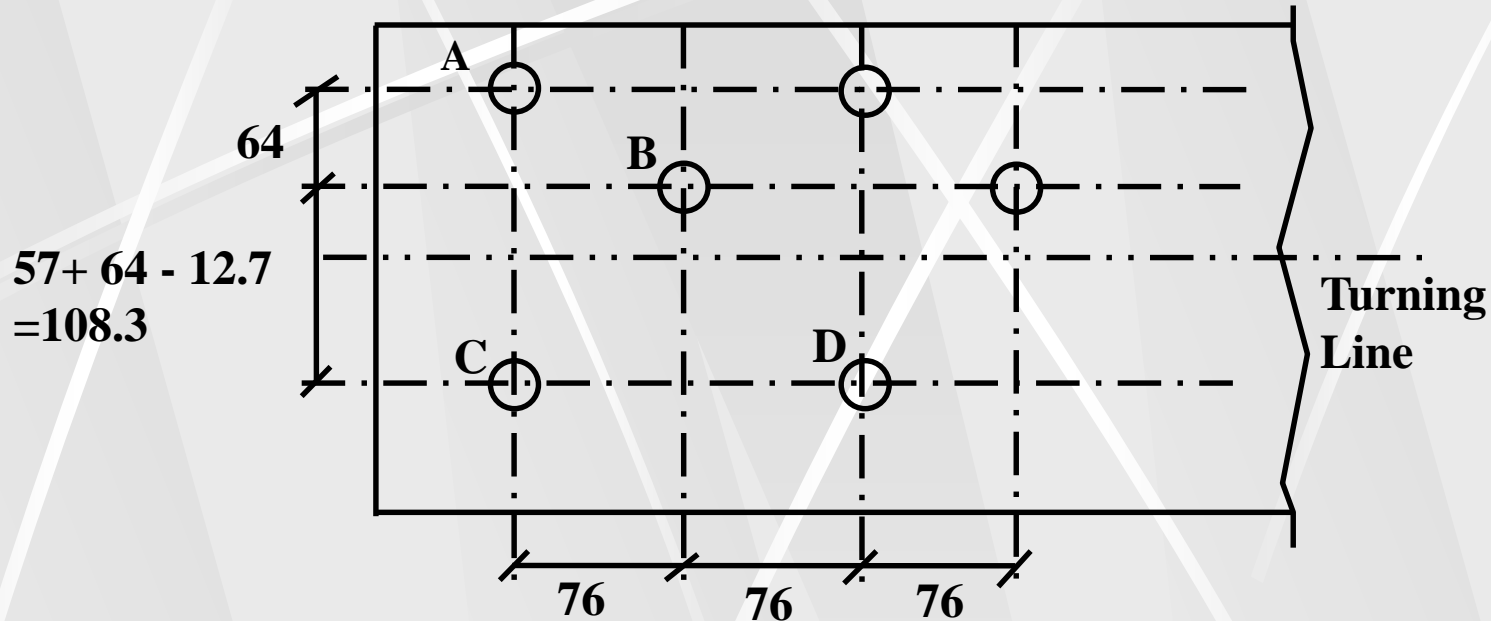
Connection Details For Angle Section of Example 2.3.
